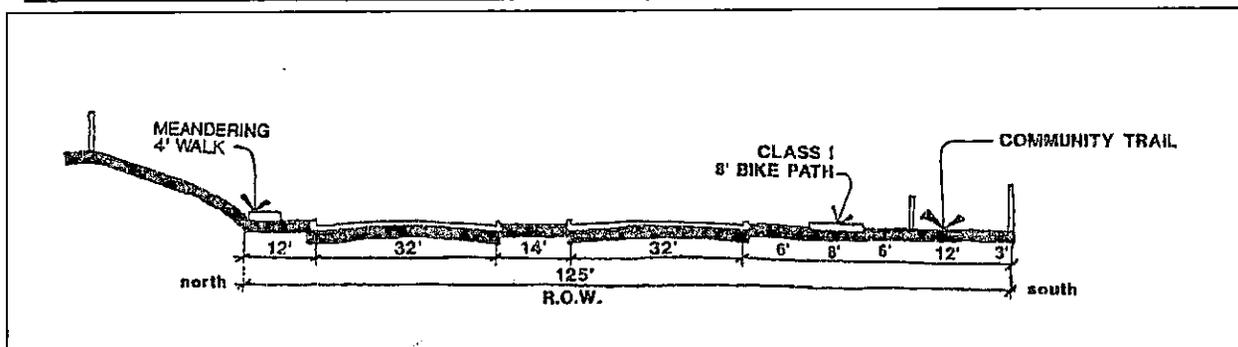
Section View - Special Divided Secondary Arterial Street (Etiwanda North Specific Plan)
